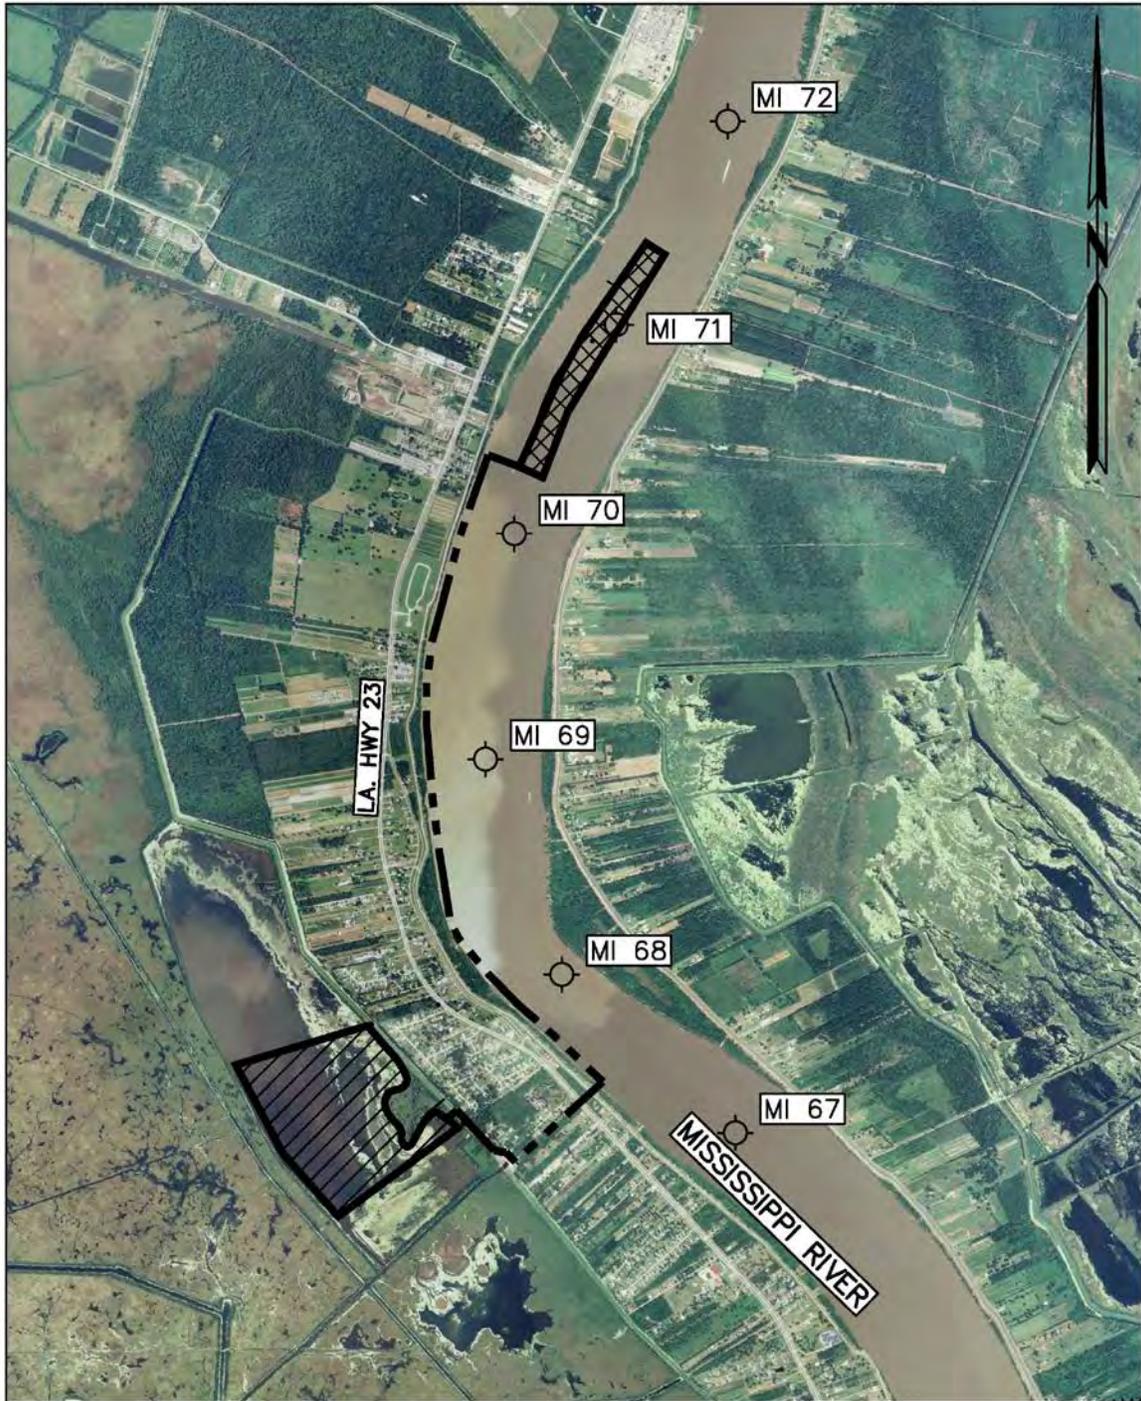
Proposed Jesuit Bend Mitigation Bank General Dredging Plan Layout.
